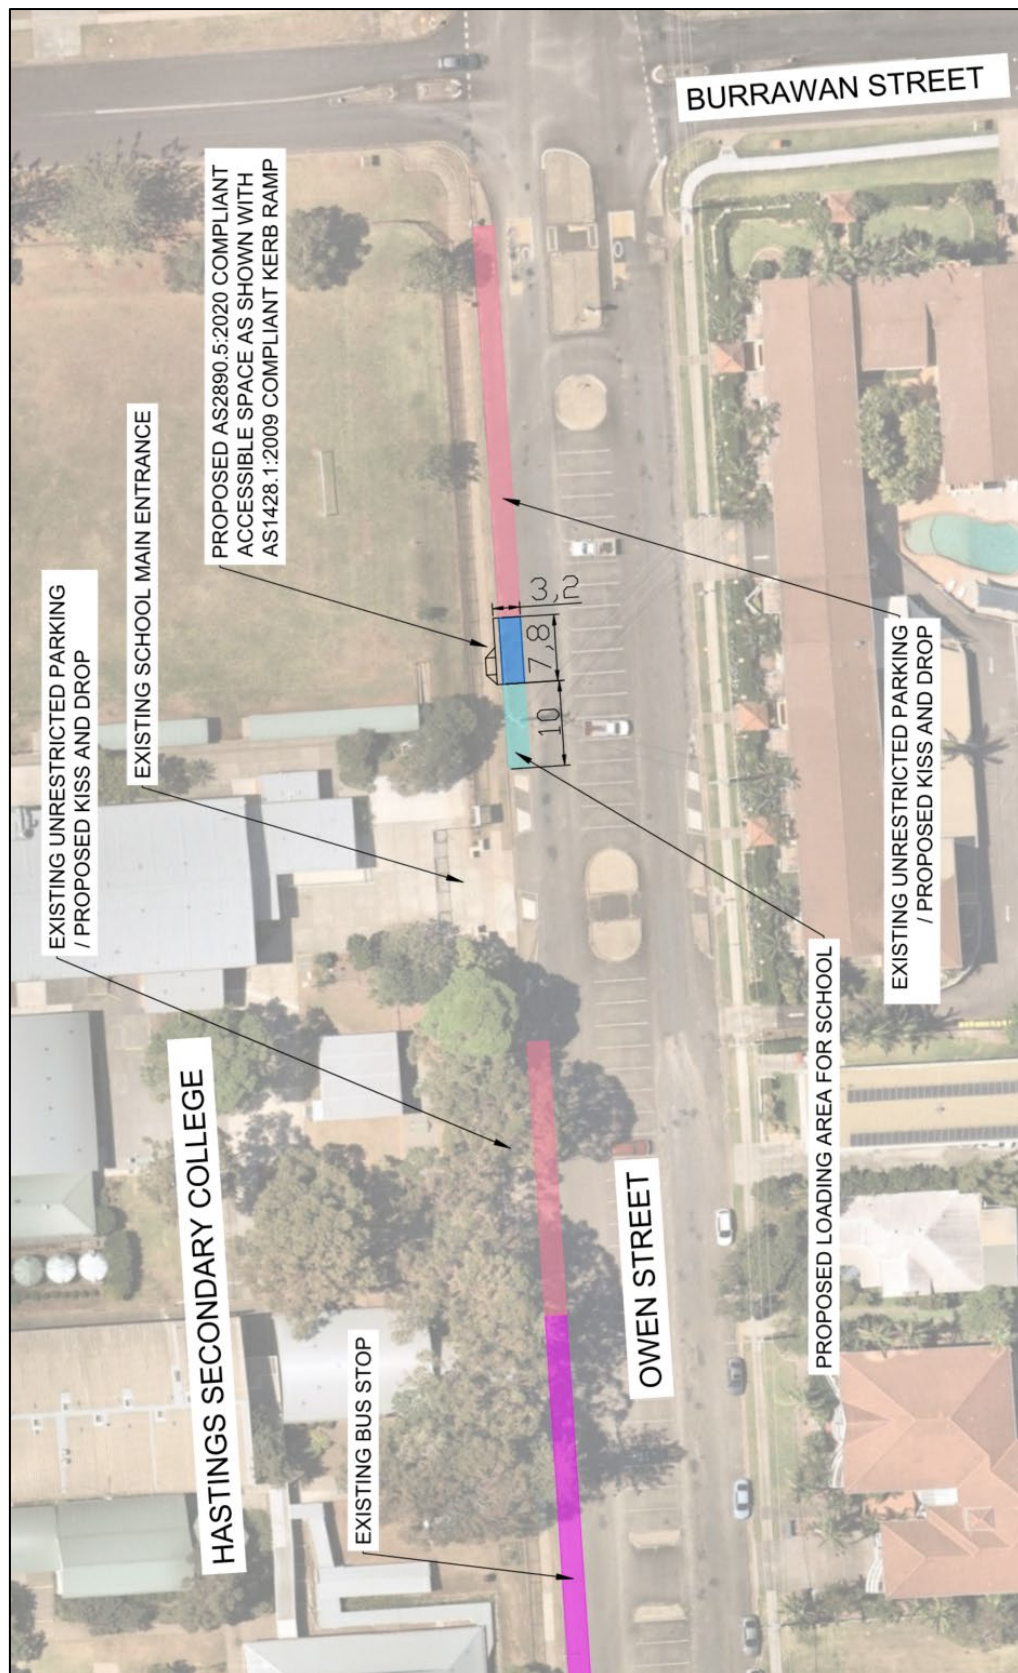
Proposed Modifications to On-street Parking – Owen Street, between Gordon Street and Burrawan Street
